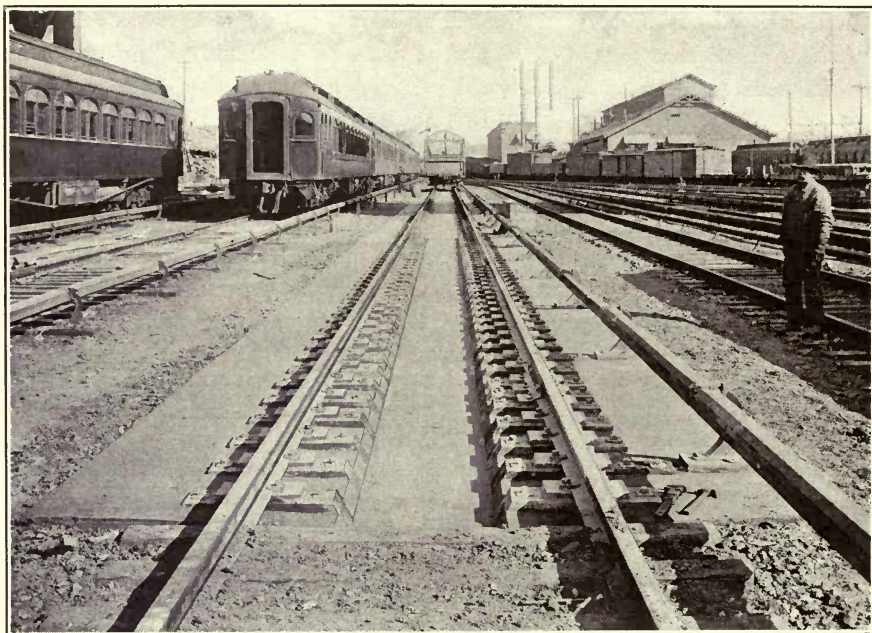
EXPERIMENTAL CONCRETE ROADBED, N. Y. C. & H. R. R. R.
